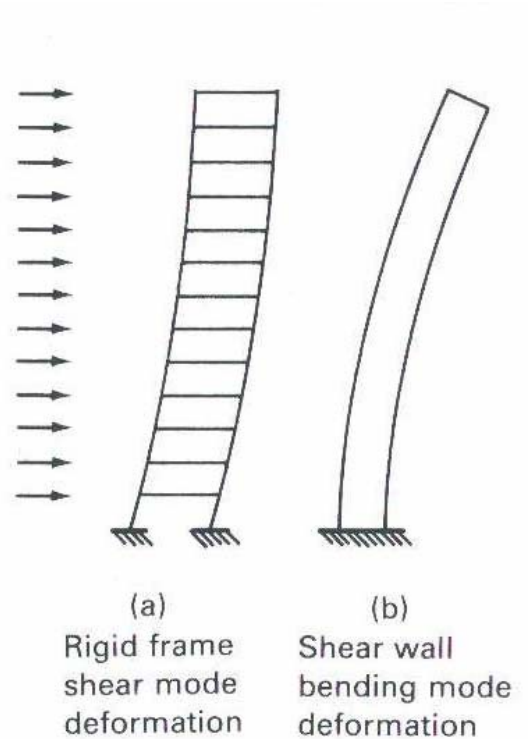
Deformation modes of a rigid frame and a shear wall system. [27]
